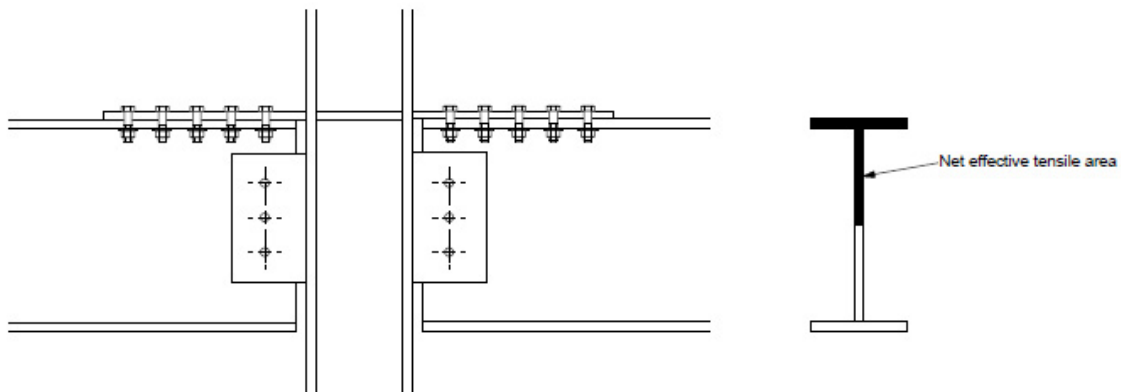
a) Top flange plate connection to transfer collector beam axial loads, b) Axial loads transferred through top flange and half the beam depth
